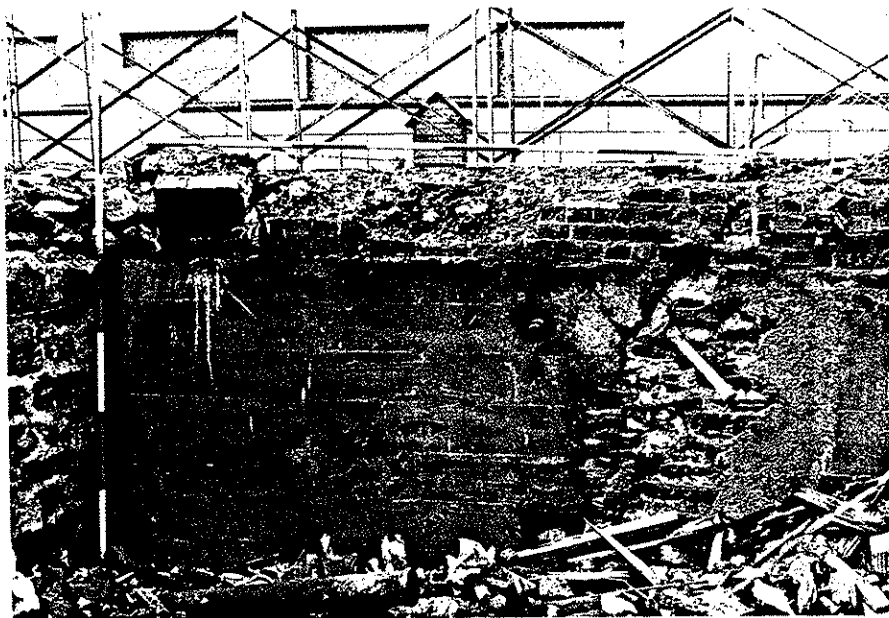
View looking west at the south-west corner foundation of the main block of the Trenton House; North Warren Street in background; scale in feet (Photographer: Lynn Rakos, November 1987).
